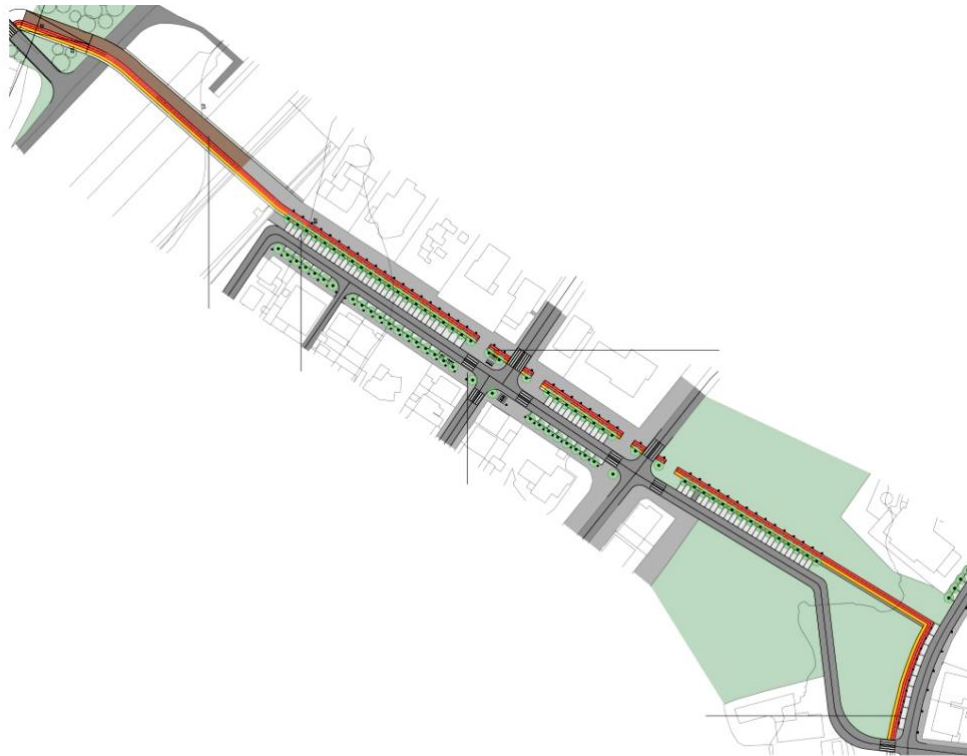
Planted Road, Spain. Author: Luis Ponte Lavandeira, 2007-2010.
